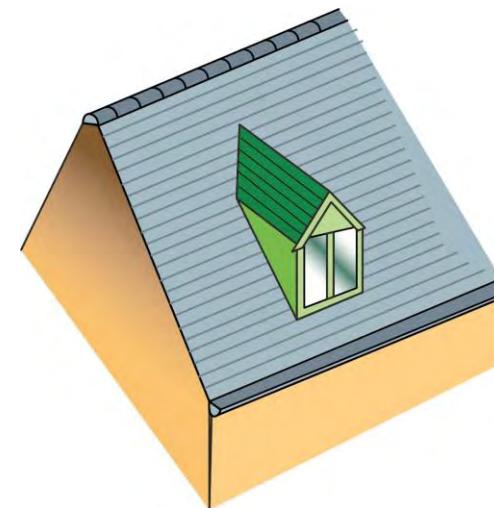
Example of a traditional vertical dormer which complements the existing pitched roof.
